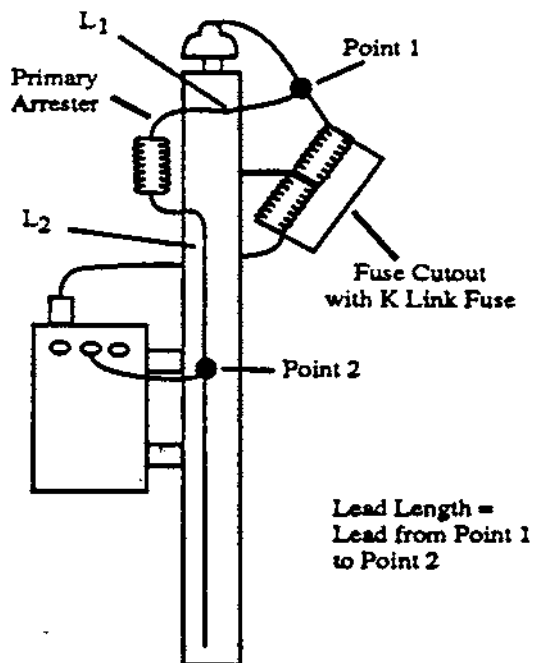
Typical Conventional Transformer Installation with Remote Mounted Arrester
